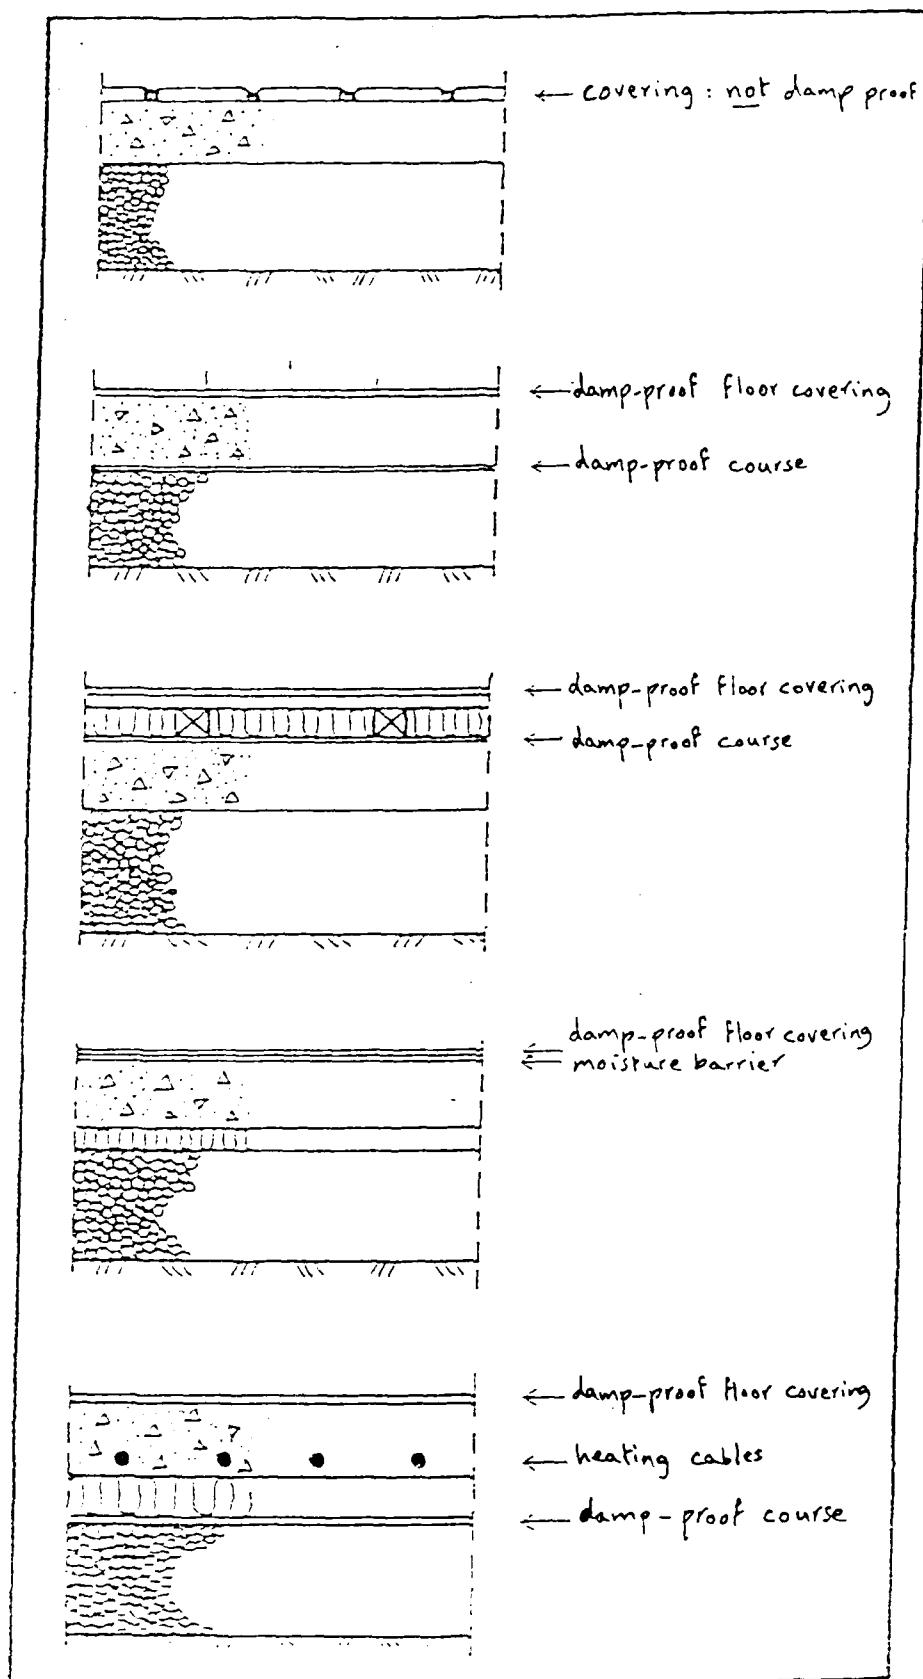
Position of the damp-proof course for floors with damp-proof floor coverings. When the floor covering is not damp-proof, no damp-proof course is necessary.
